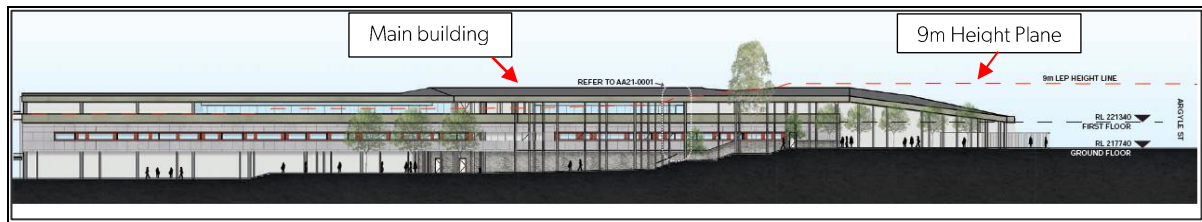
| North elevation – General arrangement (source: EIS 2018)
